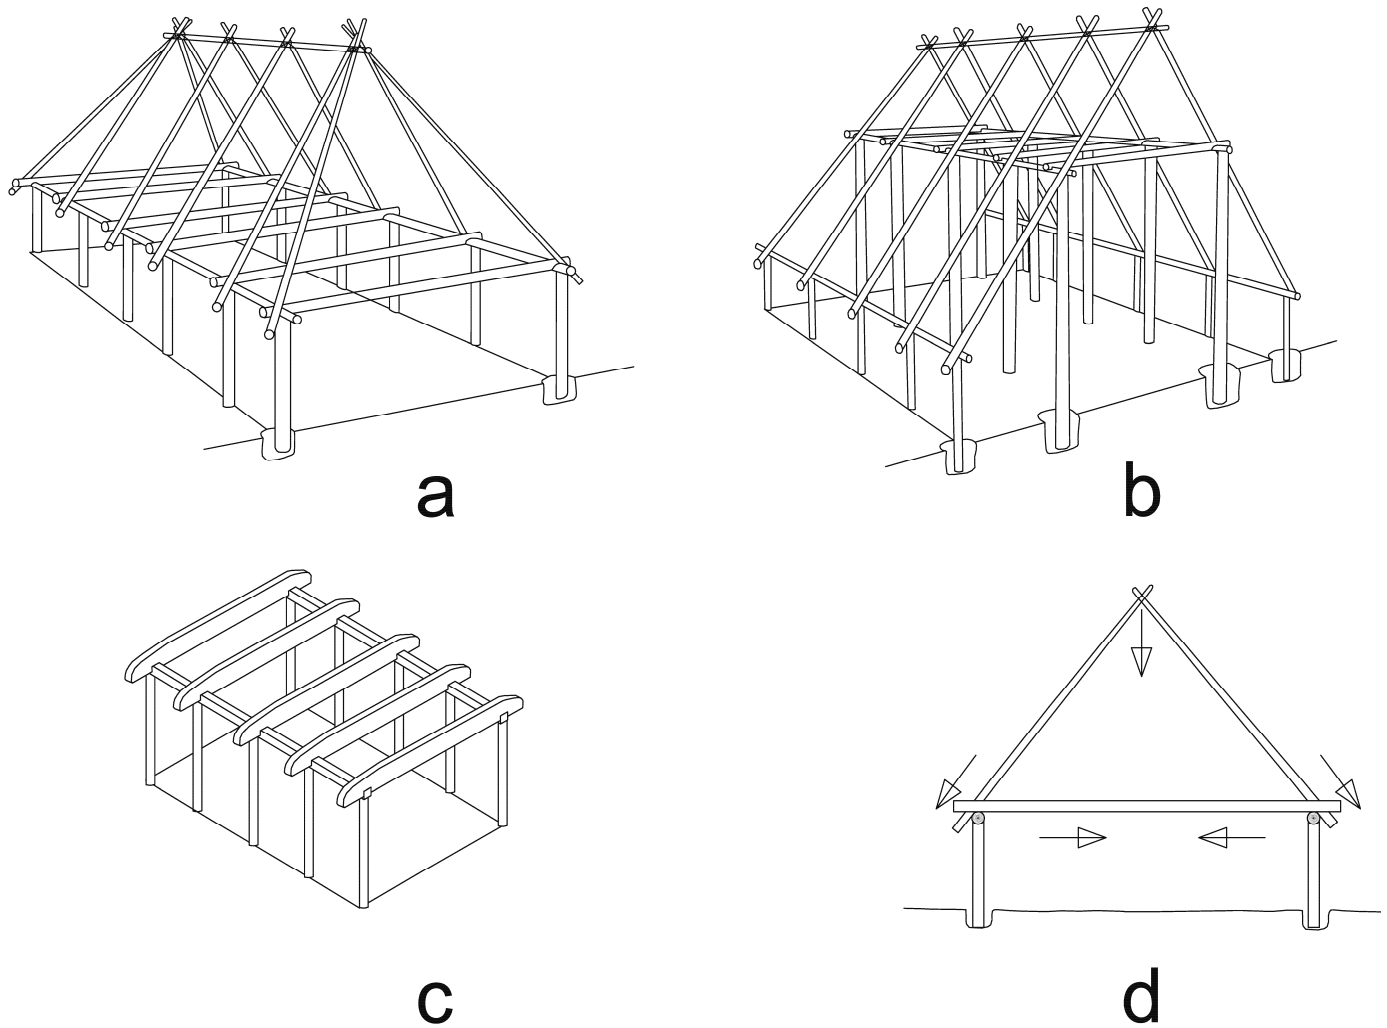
Single-aisled (a) and three-aisled (b) timber-framed buildings with embedded posts as part of a prop-and-lintel (or post-and-beam) roof construction, with use of longitudinal and transversal linkage (adapted from Audouze and Büchenschütz 1992, fig. 27.2 and fig. 27.3, respectively); (c) the posts have to be aligned both longitudinally and transversally (adapted from Brunskill 1994, figs d6a, d6b); (d) in this system, all the loads of the roof are distributed over the posts, well above ground (adapted from Audouze and Büchenschütz 1992, fig. 36.2).
